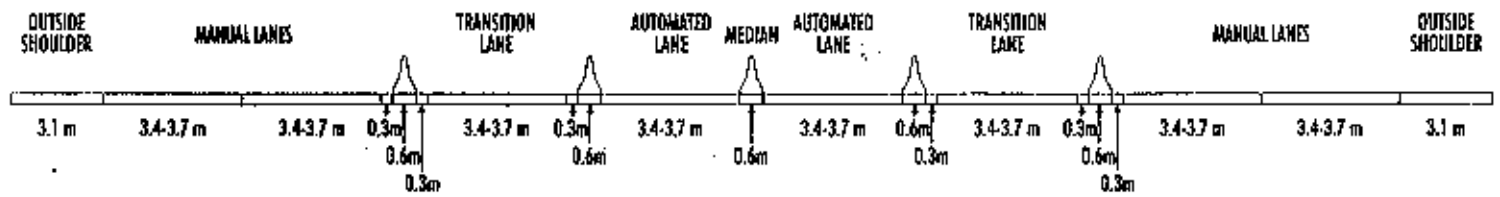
Typical Cross-Section of At-Grade Shared Configuration for AHS
